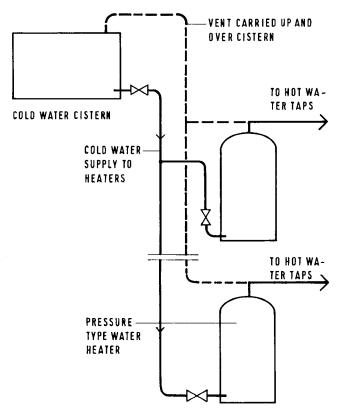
PRESSURE TYPE WATER HEATER AND PIPING DIAGRAM ( ADAPTED FROM "ENVIRONMENT AND SERyices" by peter burberry, mitchell's building construction, b t batsford Ltd. London).
